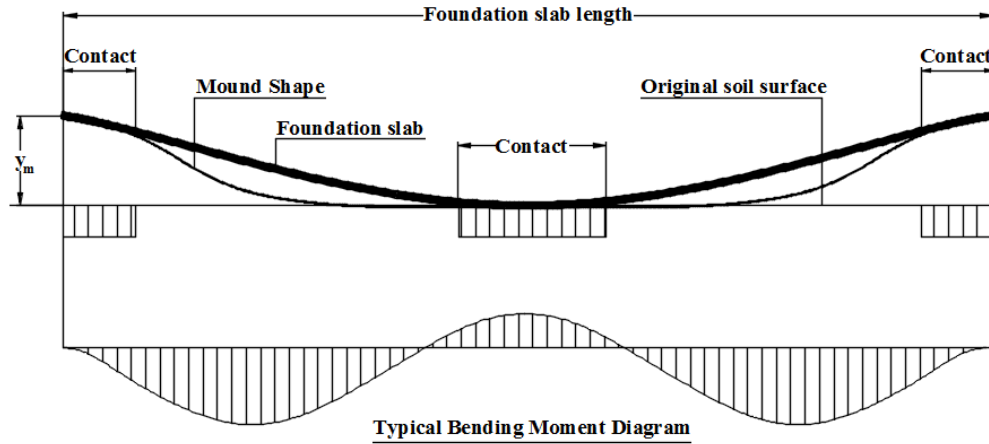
Typical mound shape, footing shape and bending moment for flexible slab foundation with large dimensions in the edge lift scenario.
